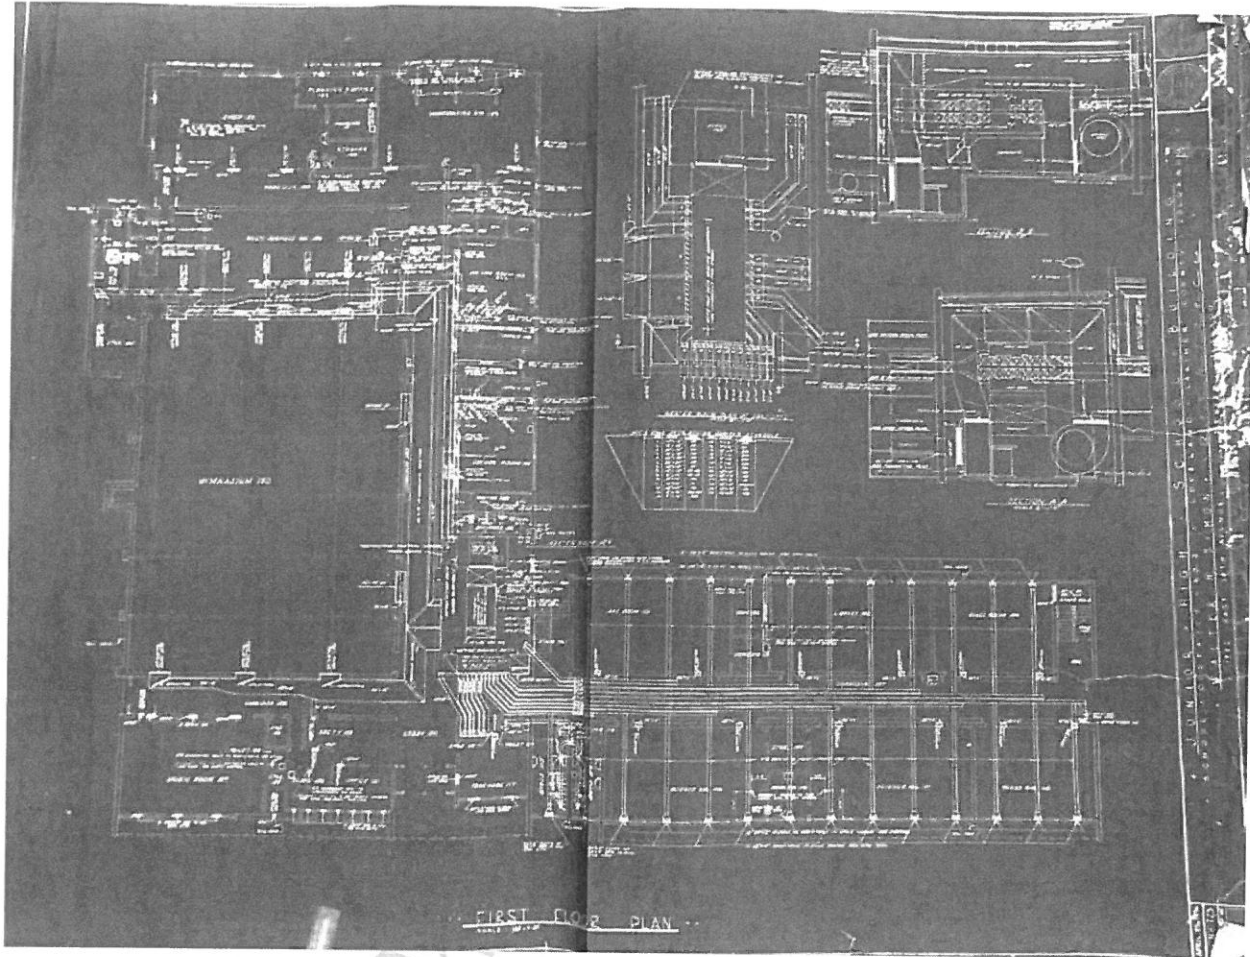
First-floor plan of the Truscott Junior High School by Denver architect Walter H. Simon, 1957. Source: Thompson School District archives.
